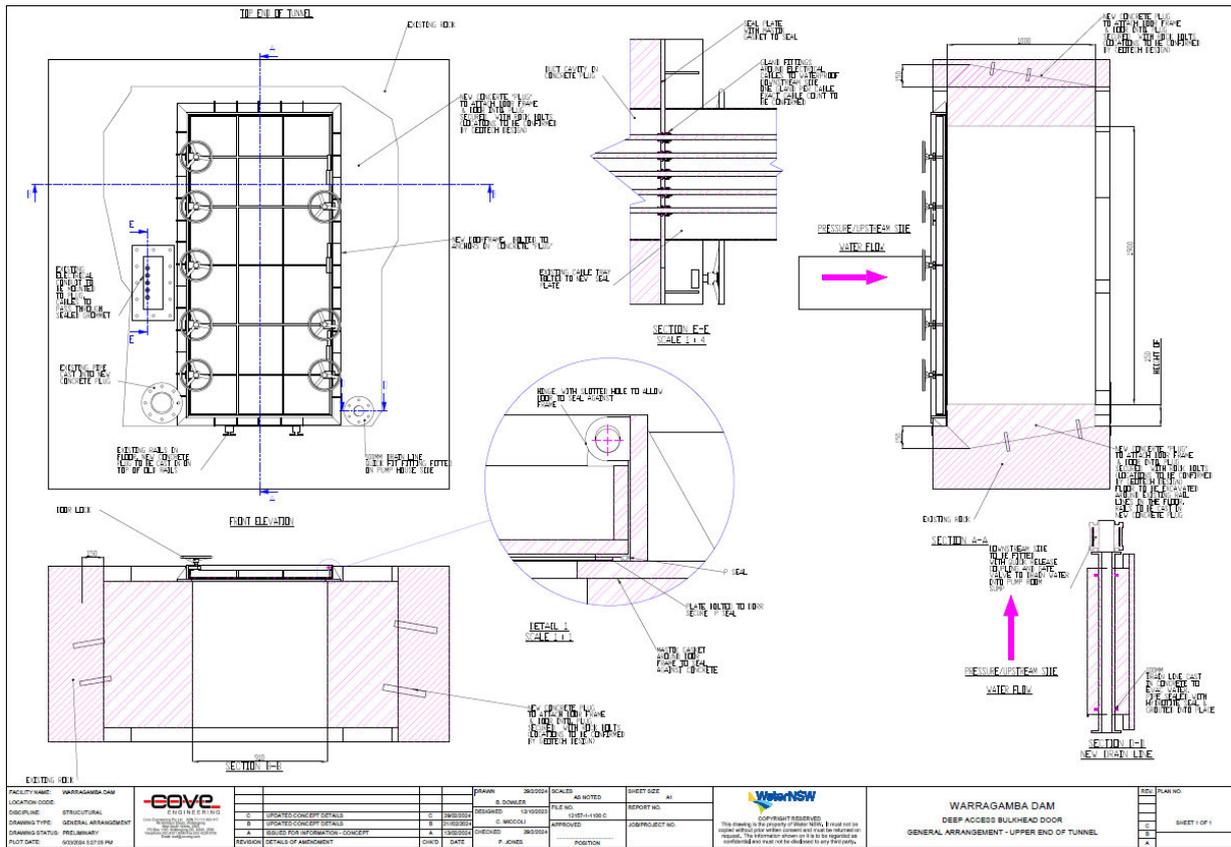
Concept design for the new flood door located at the upper end of the adit tunnel. *Source:* Cove Engineering 2024
